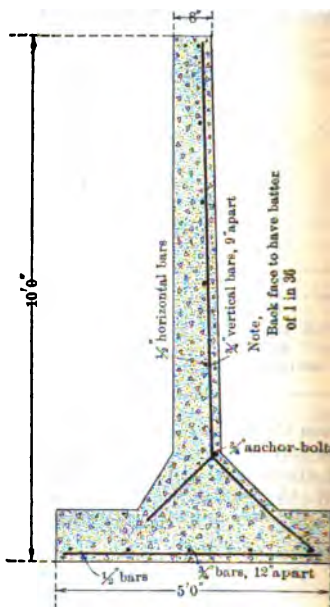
Reinforced-concrete Retaining-wall, 10 ft High
